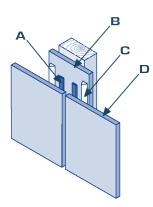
# DETAILED DRAWINGS OF ROCKPANEL TACK-S ADHESIVE SYSTEM
